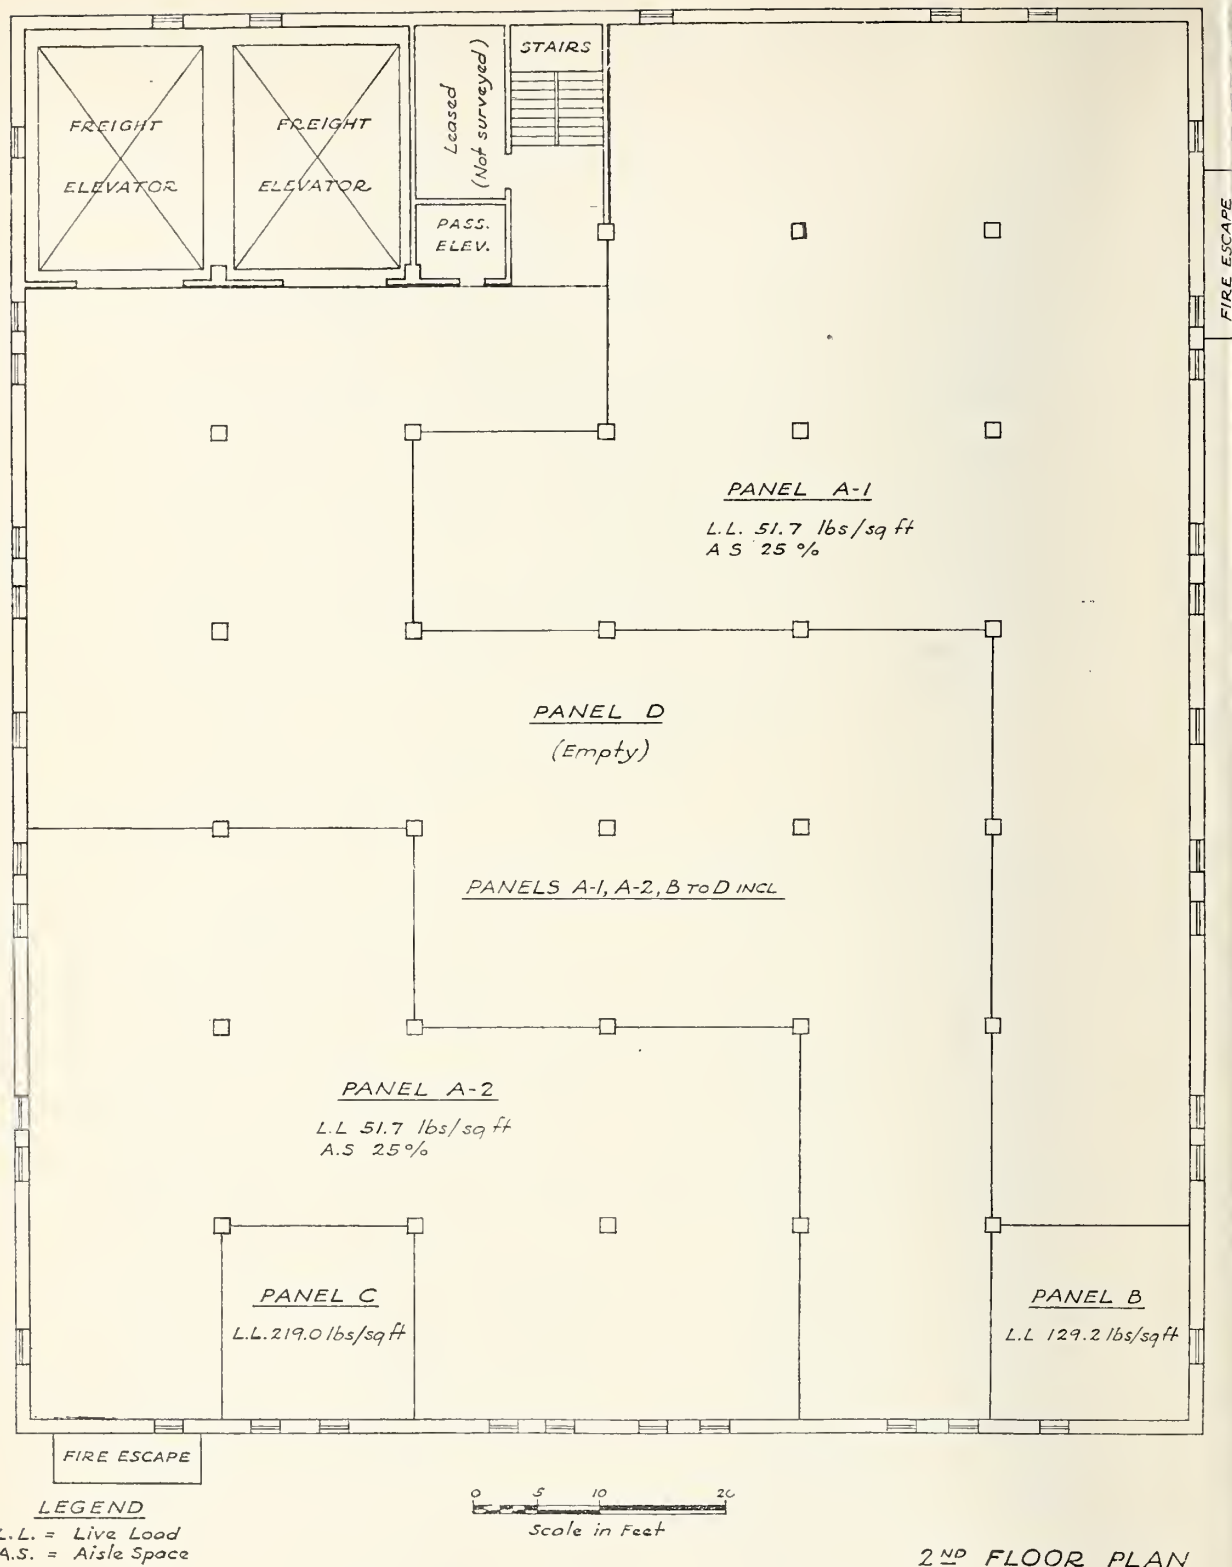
Second-floor plan, warehouse, Washington, D. C.
